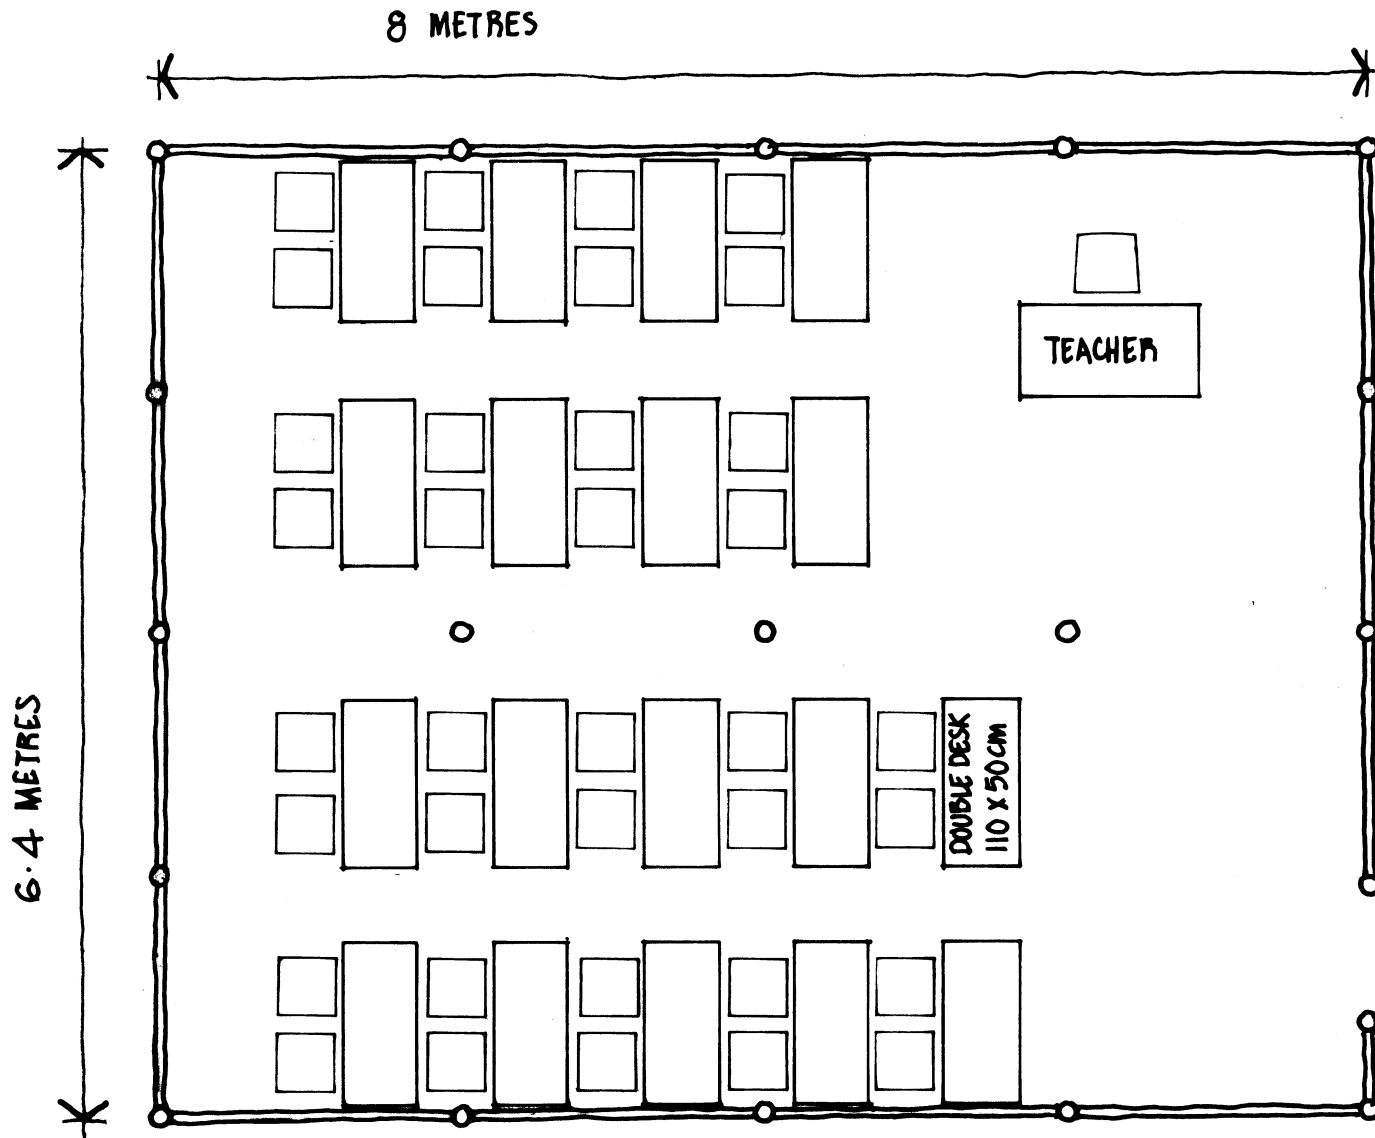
PROPOSED PRE-SCHOOL LAYOUT
